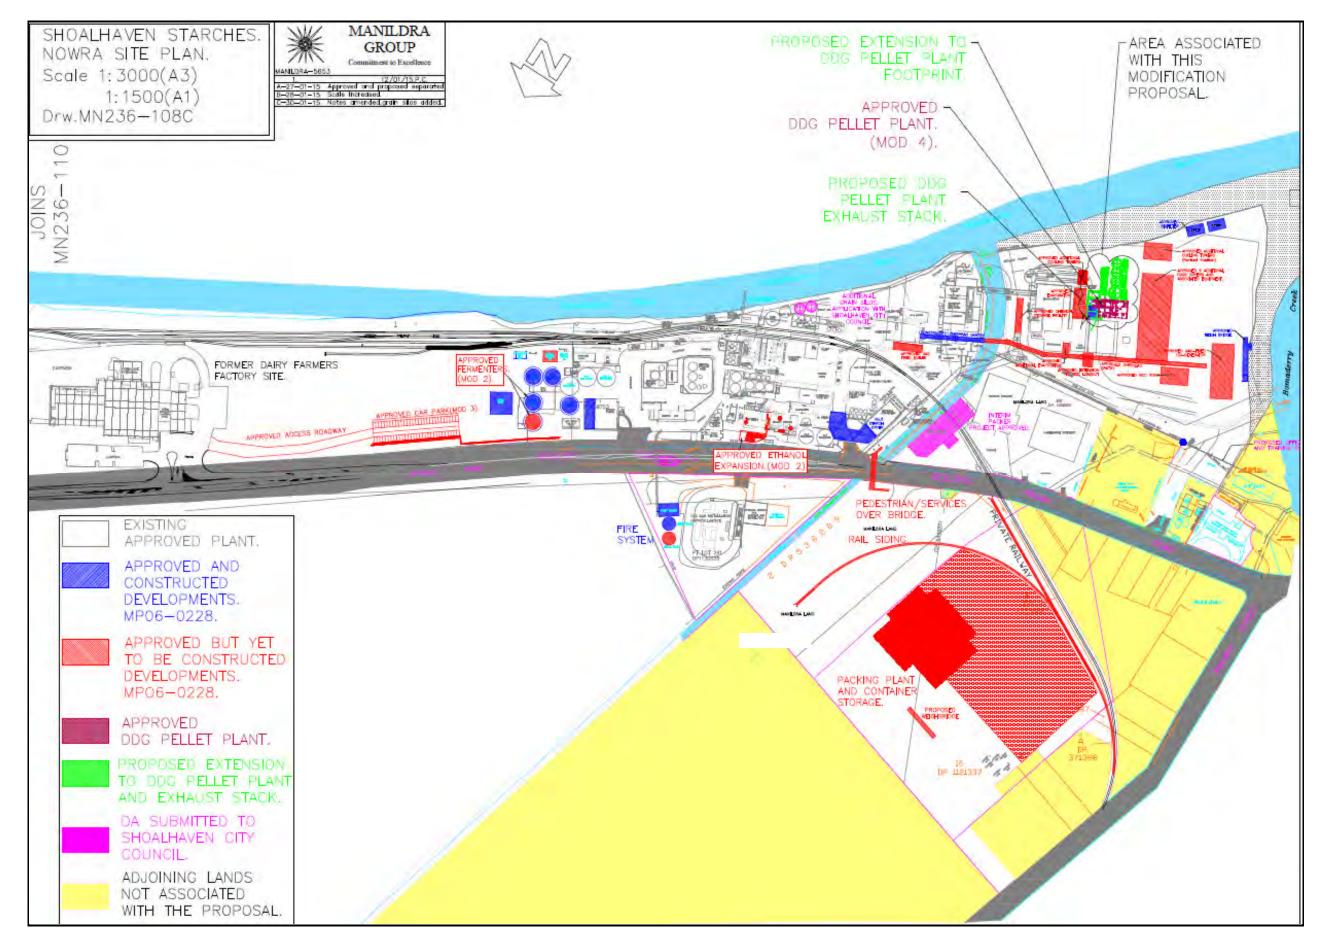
Site Plan Depicting Proposed Additions to Factory Site.
